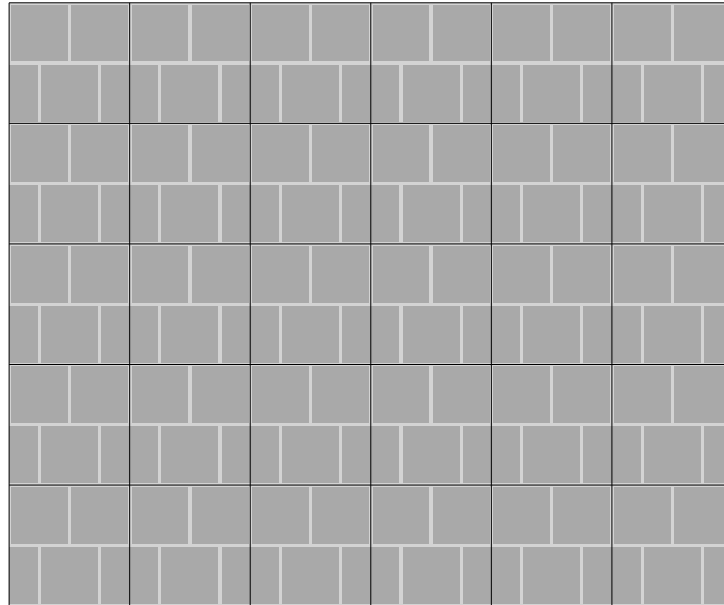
Masonry wall constructed by assembling RVEs in a 5x6 grid.
